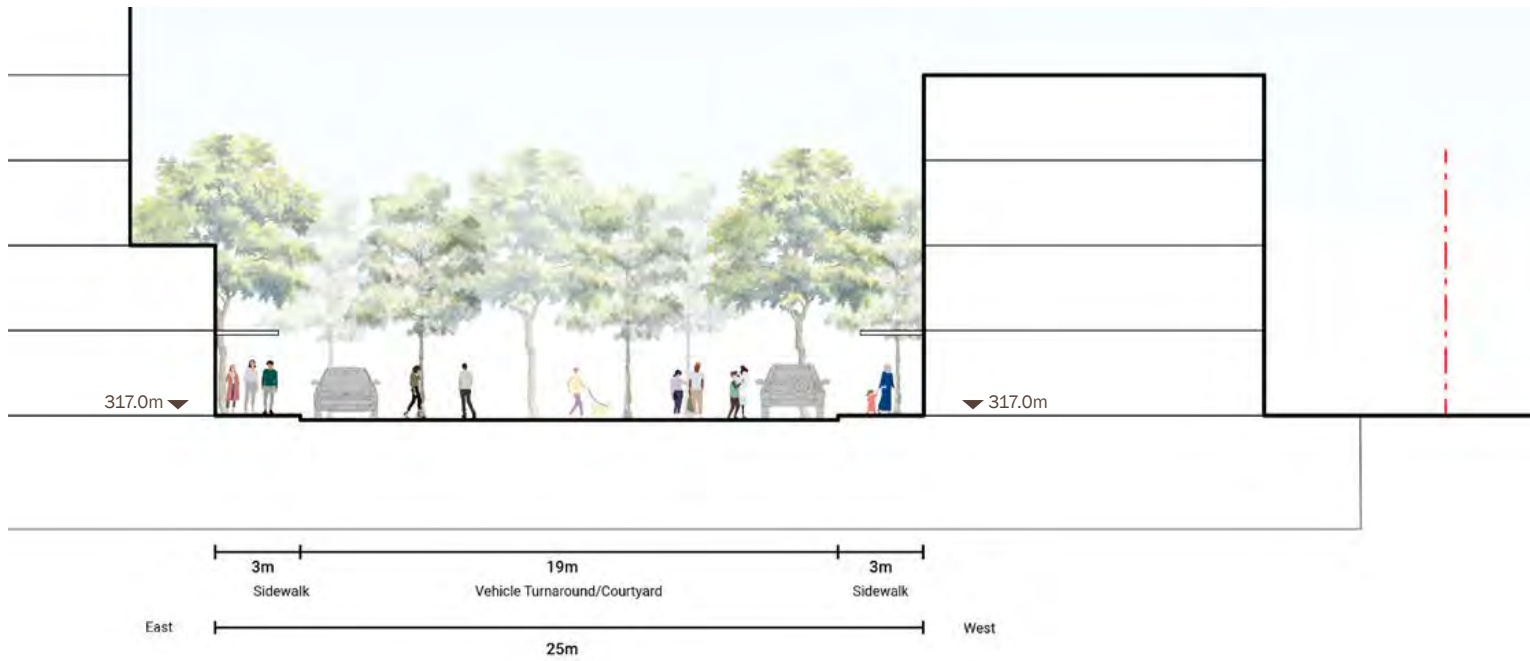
Elizabeth Lane Plaza Cross-Section 2 Looking South
